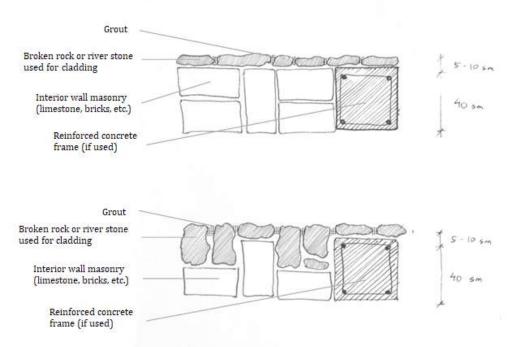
When cladding the masonry with river stones or quarry stones, in accordance with the logic of masonry, the stones should be laid parallel to the ground on the longer side, and the gaps between the stones should be filled with traditional grout because the colour of cement-based adhesive does not match the colour of stones.
